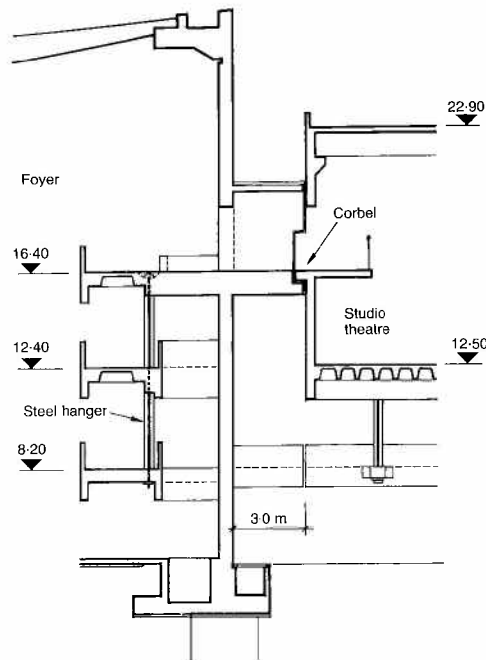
Section through north wall of foyer adjacent to studio theatre
